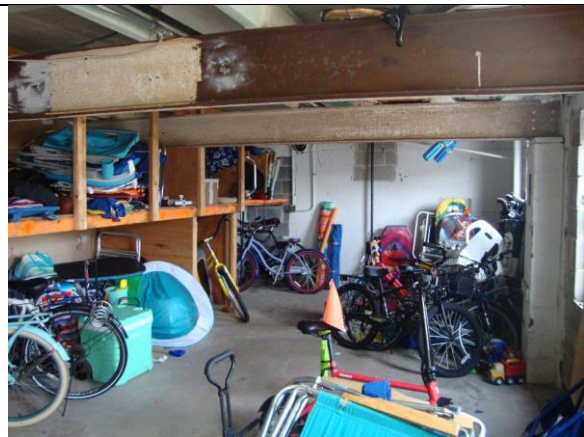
Rusting structural steel beams in the middle rear storage room.
